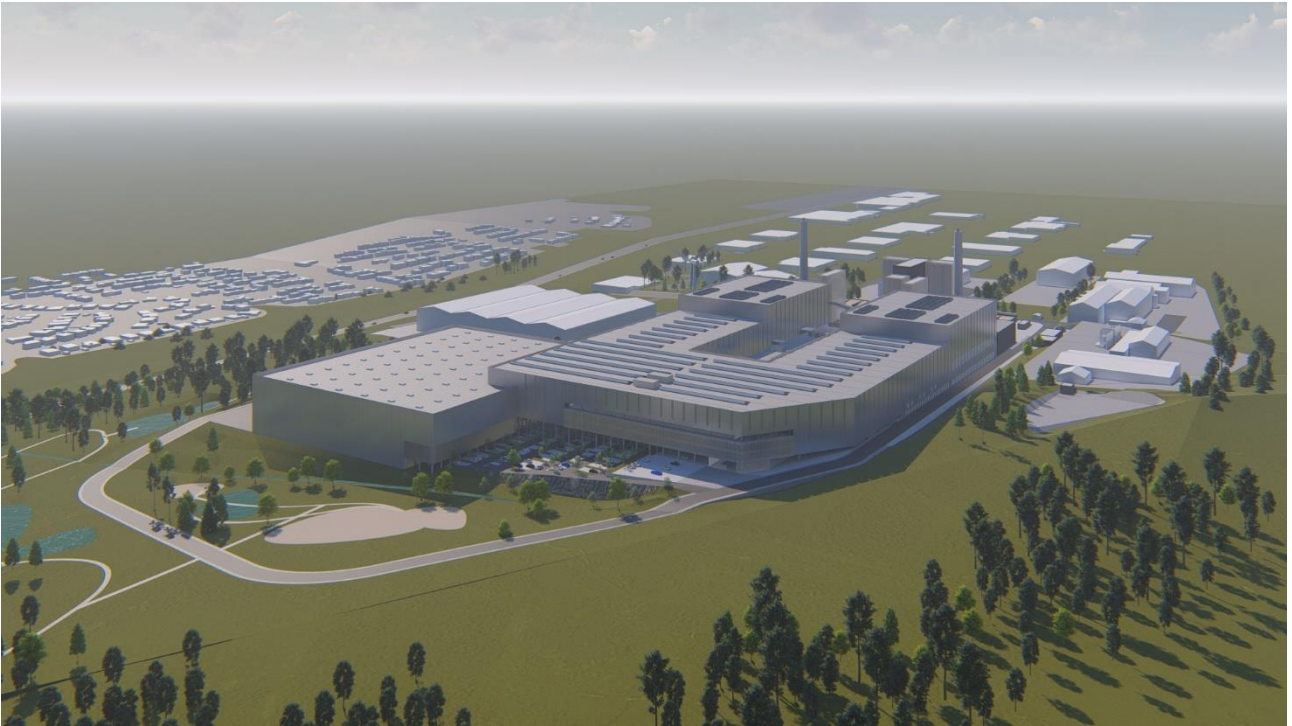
View from the North East Corner of the site – Proposed Scheme
